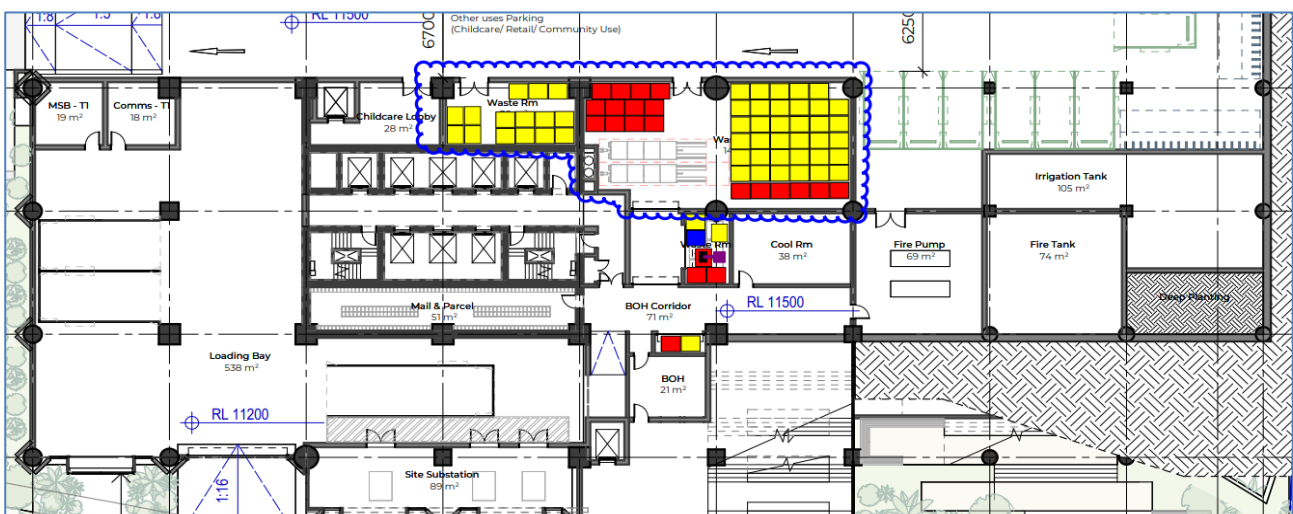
Tower 1 Refuse Discharge, Storage and Collection Room
